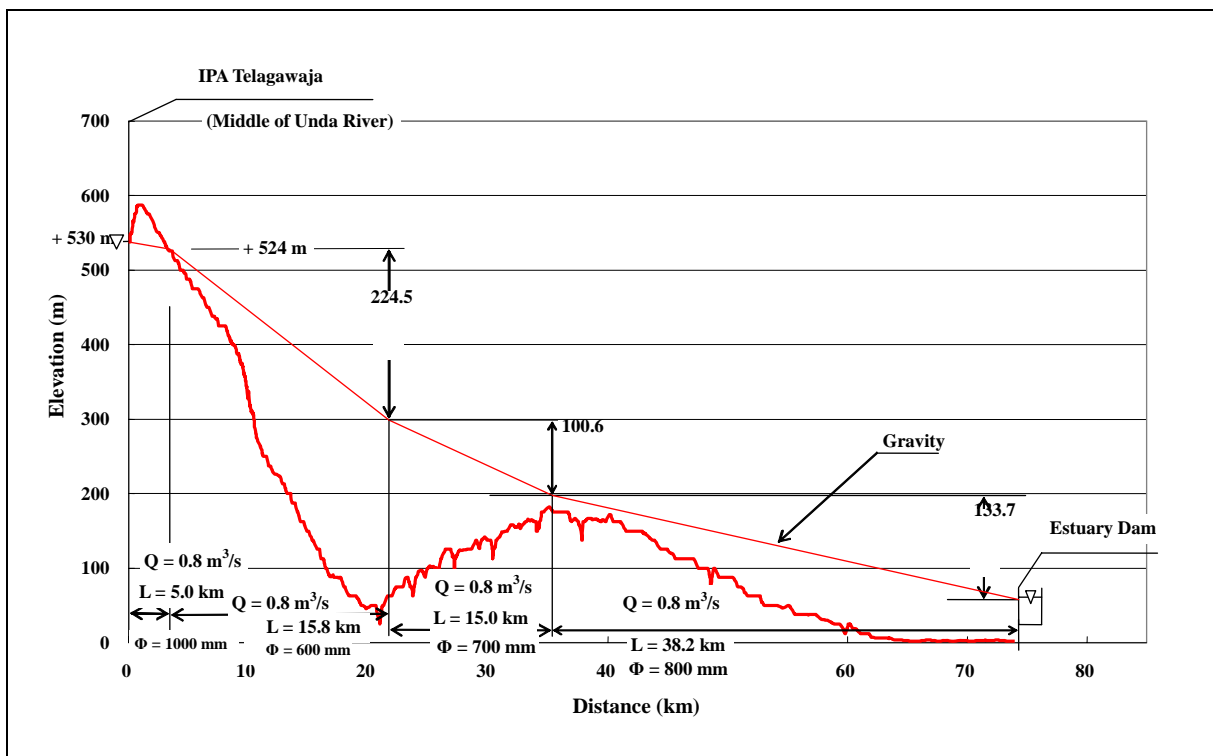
Longitudinal Section and hydraulic Gradient Line of Alternative E1
